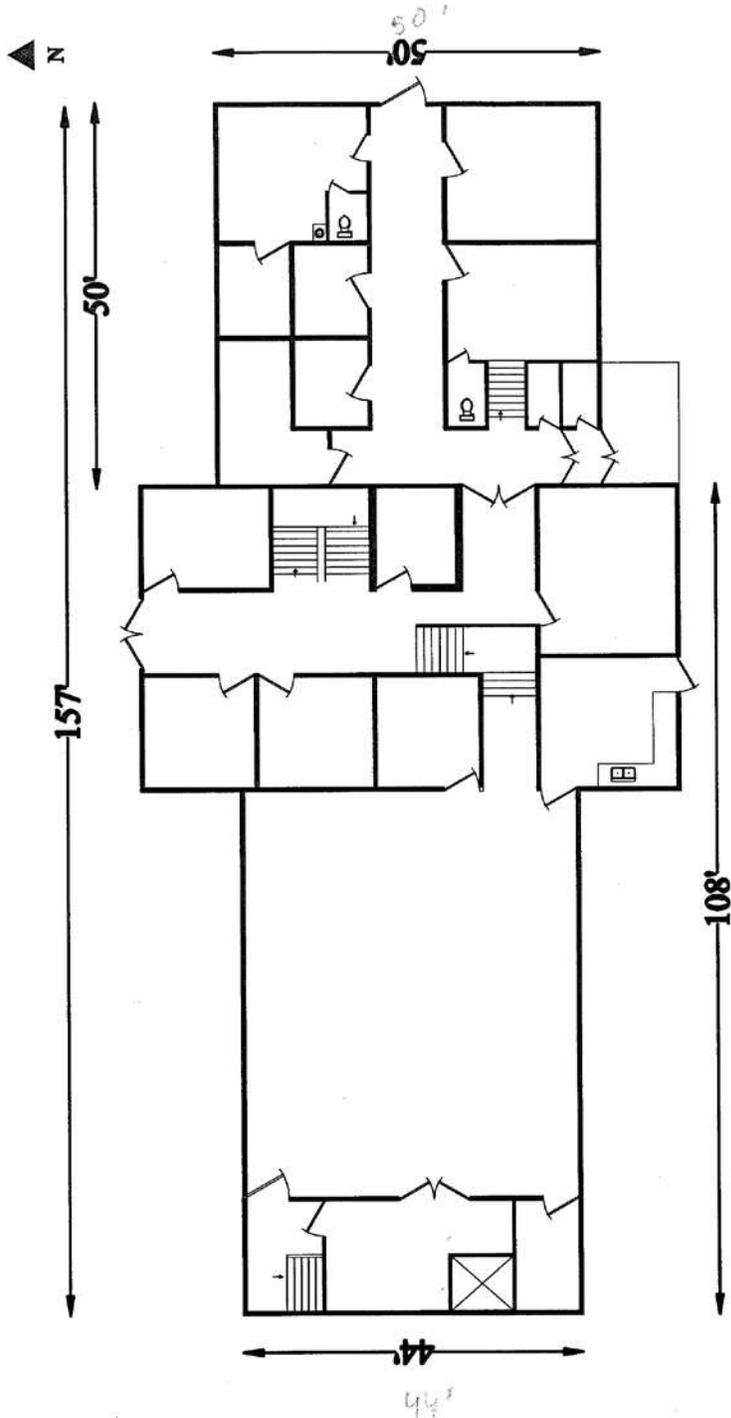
Figure D First Presbyterian Church. First Floor Plan (Basement, front. Main floor, rear. Current. Not to scale).
